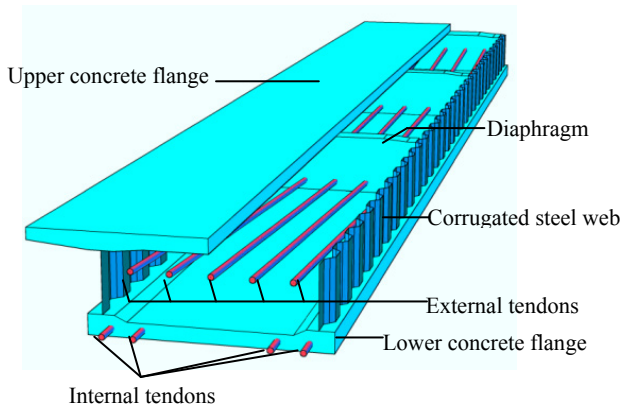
A prestressed concrete bridge with corrugated steel webs (some parts of the bridge are omitted for clarity)
